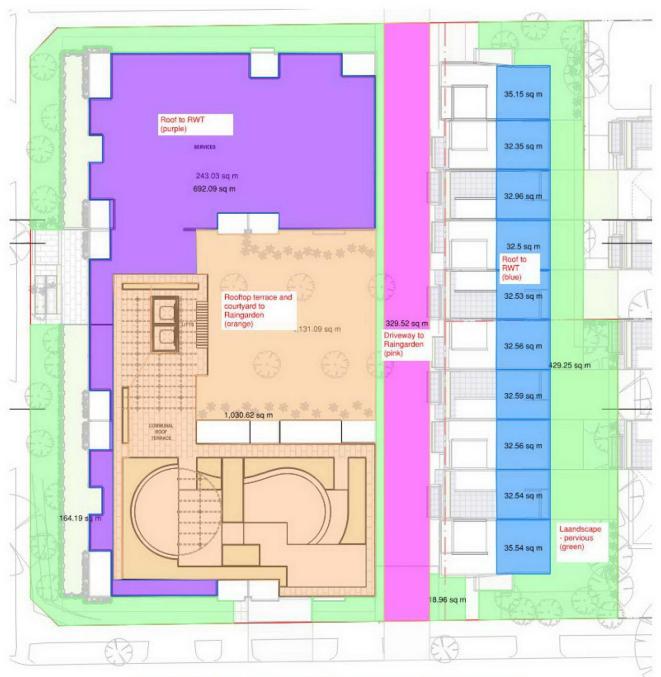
Site delineation for 256-262 Huntingdale Road, Huntingdale
